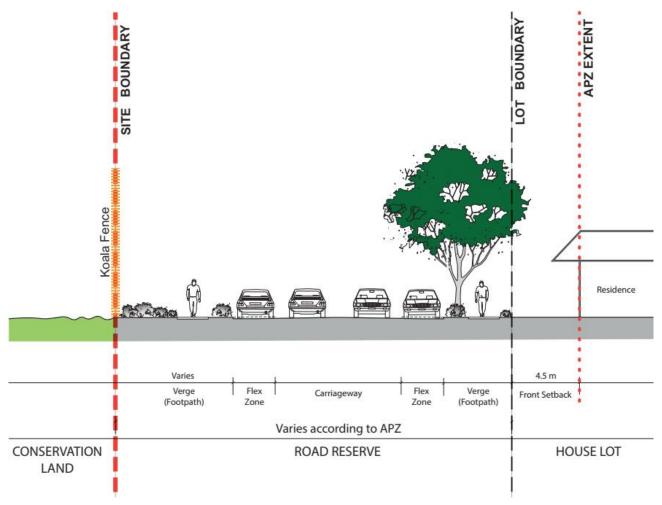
Indicative Perimeter Road Cross Sections. (Primary Local Road)
